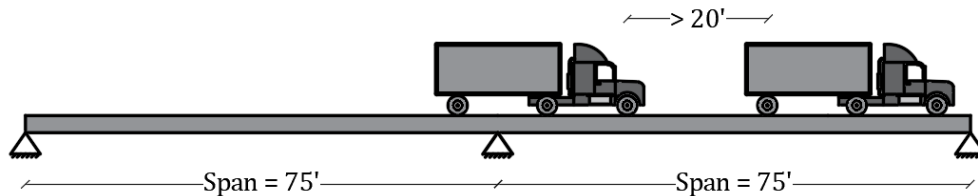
A two-truck platoon configuration for a two 75-ft. span bridge with a headway spacing of longer than 20 ft.
